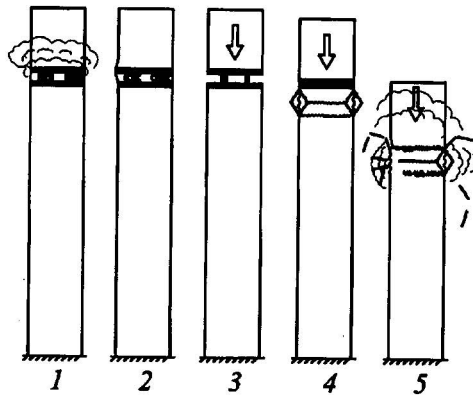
Stages of collapse of the building (floor height exaggerated)
